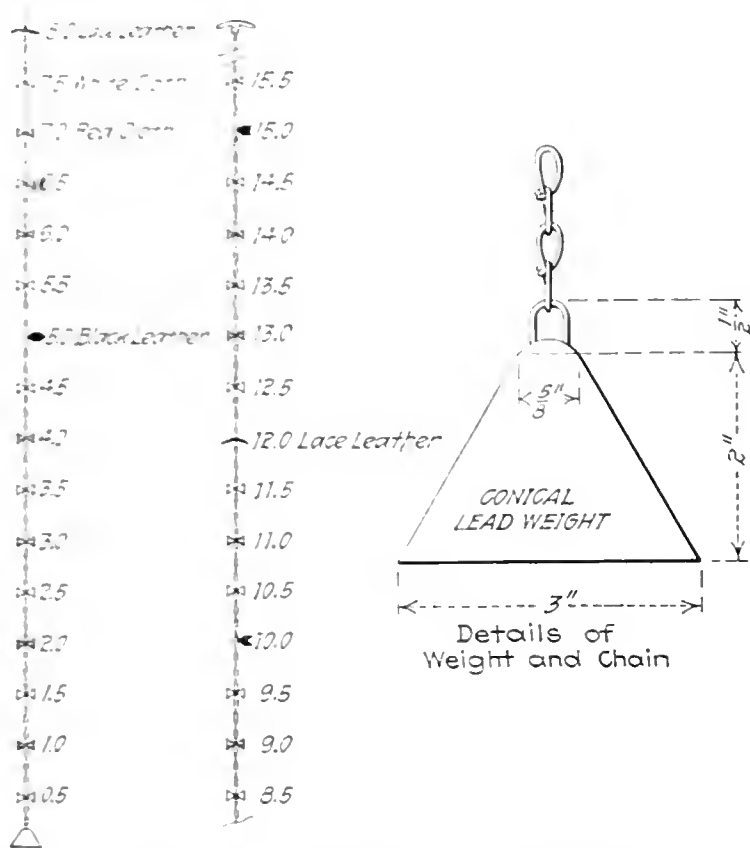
SOUNDING LINE USED ON DRAINAGE DITCHES
